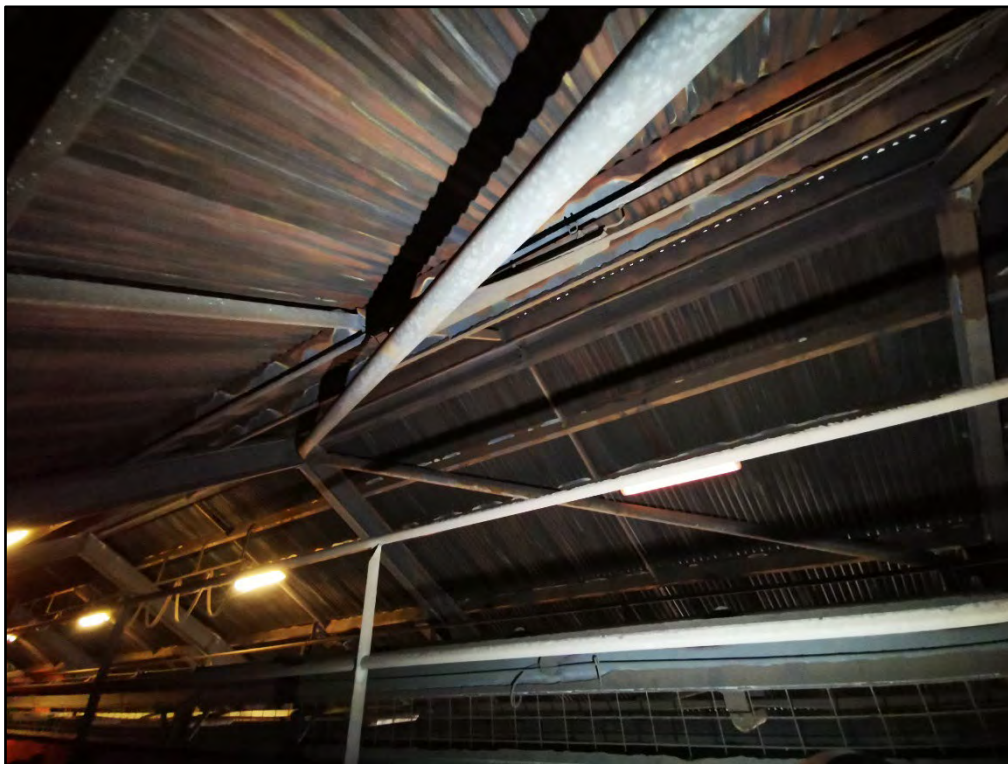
Surface Corrosion of Purlins and Roof Sheeting
